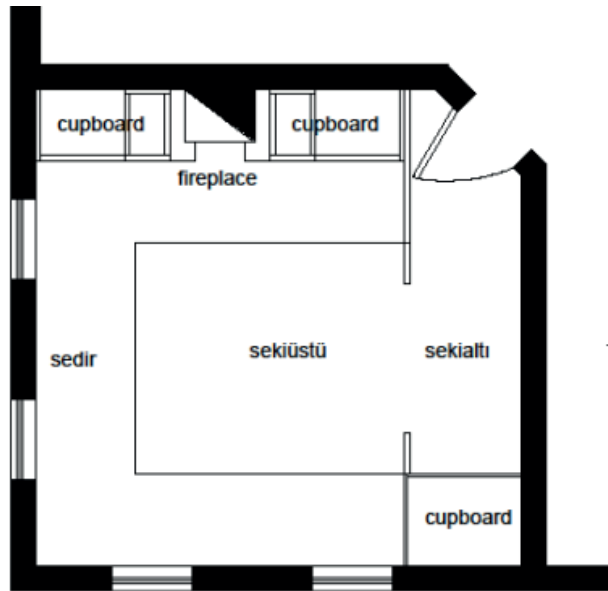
Room plan (Karamustafagil house); drawn by the author
